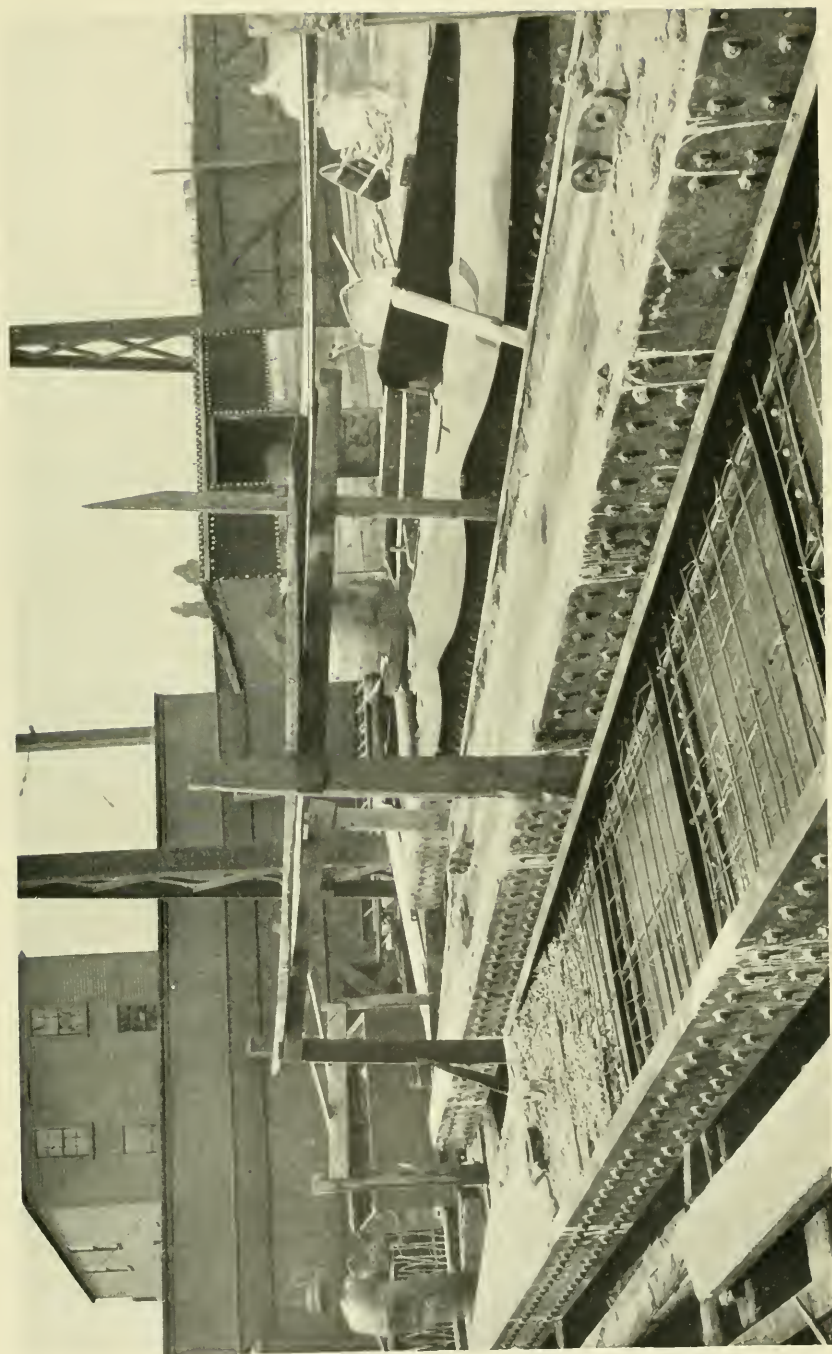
PLACING CONCRETE PROTECTION ON WEBS OF NEW CITY FLOOR BEAMS.
